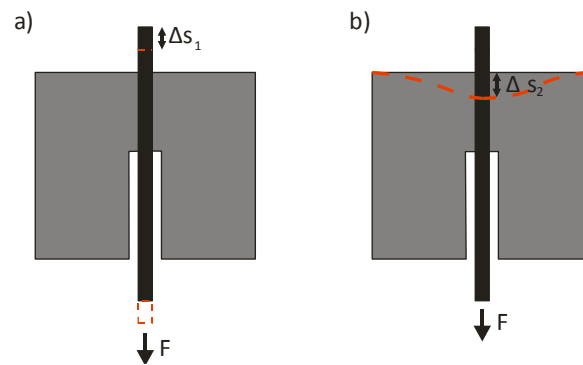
Slip due to: a) rebar movement, b) concrete deformation.
